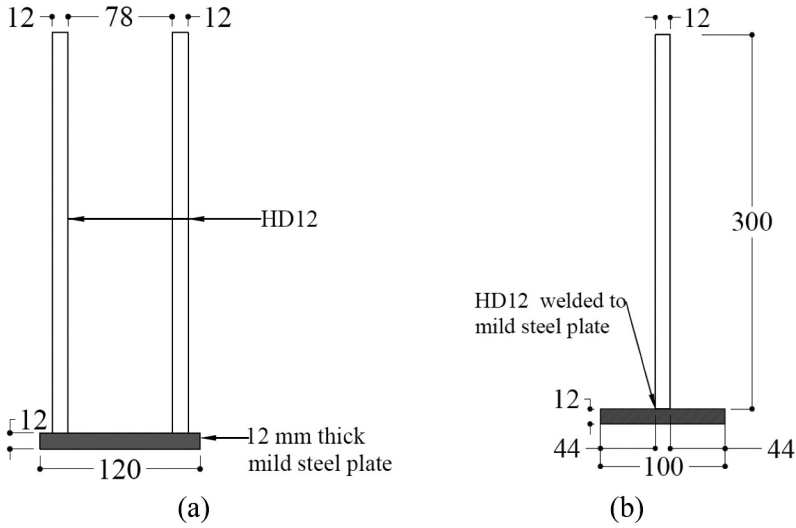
Weld-plate details (dimensions in mm): (a) front view; (b) side view.
